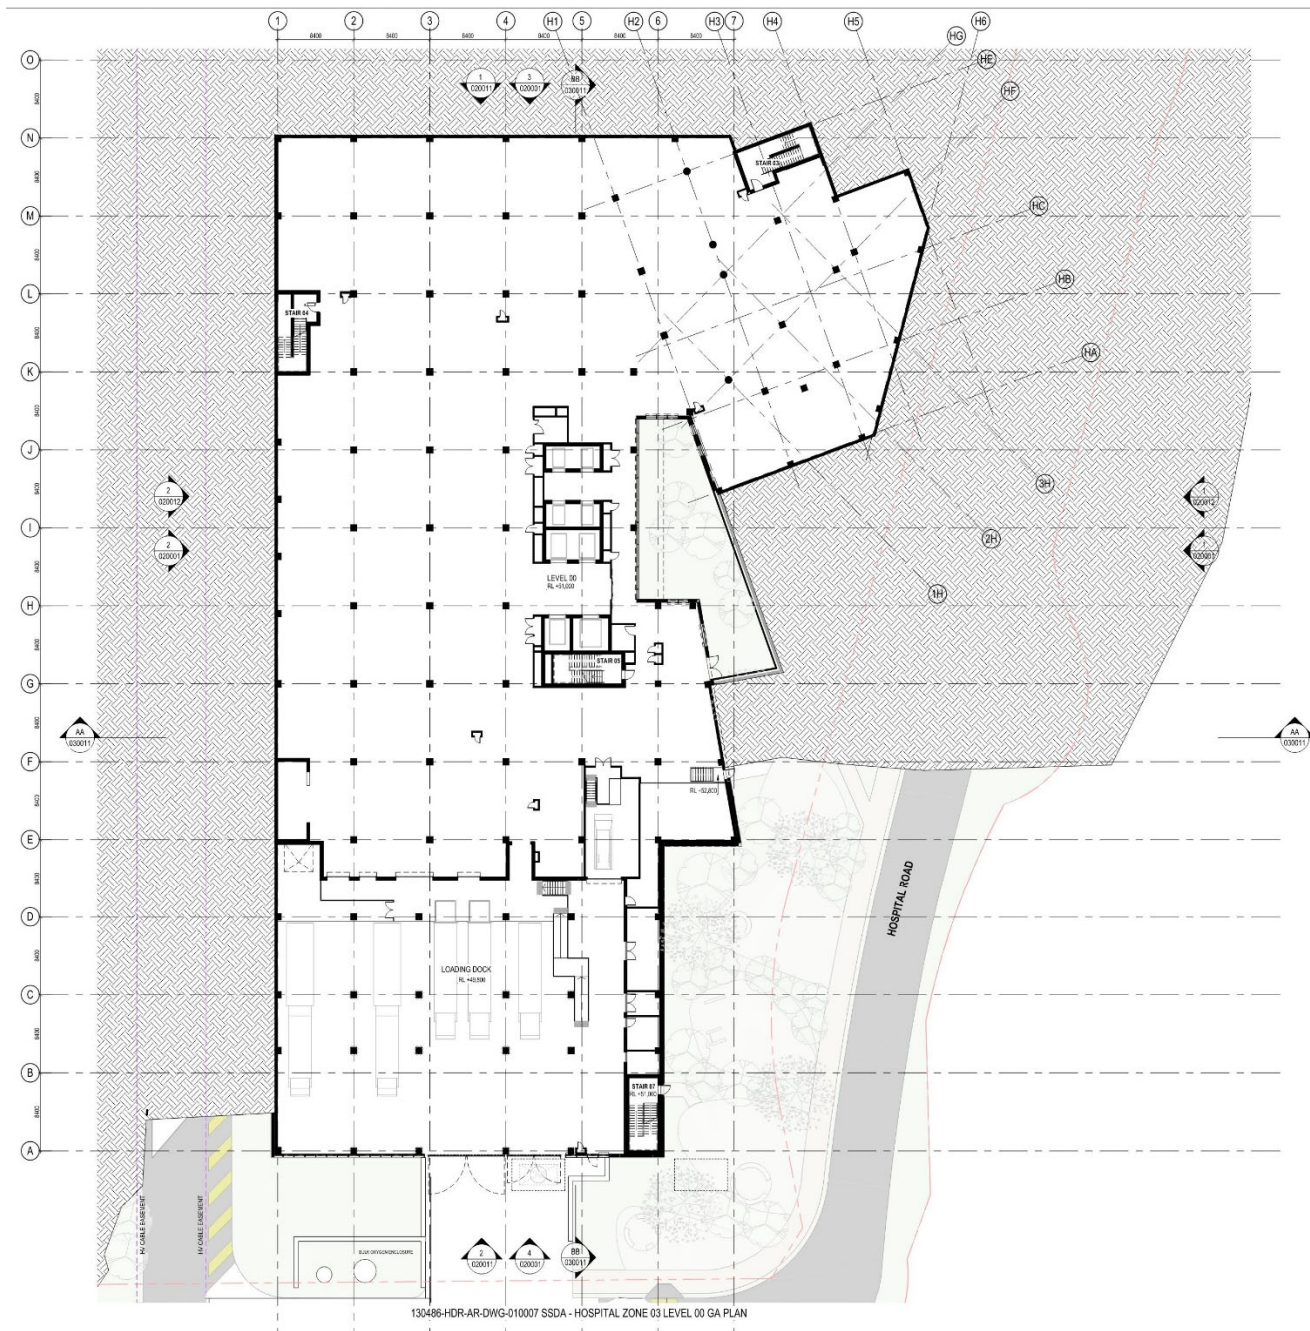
Level 00 – General arrangement plan (source: HDR, 07/08/2025)
